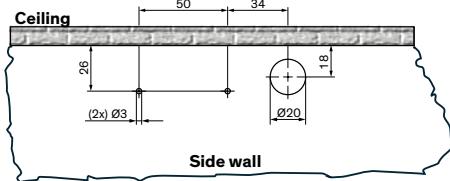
Drilling holes for surface mounting to the ceiling (view from bottom to ceiling)
